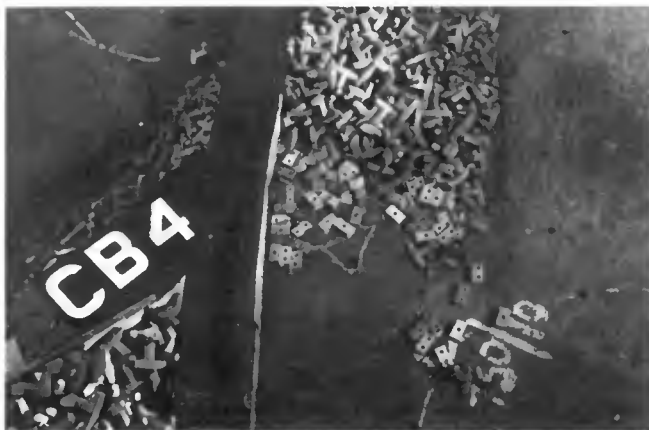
Damage to advancing face of breakwater protection by 2,8m wave
